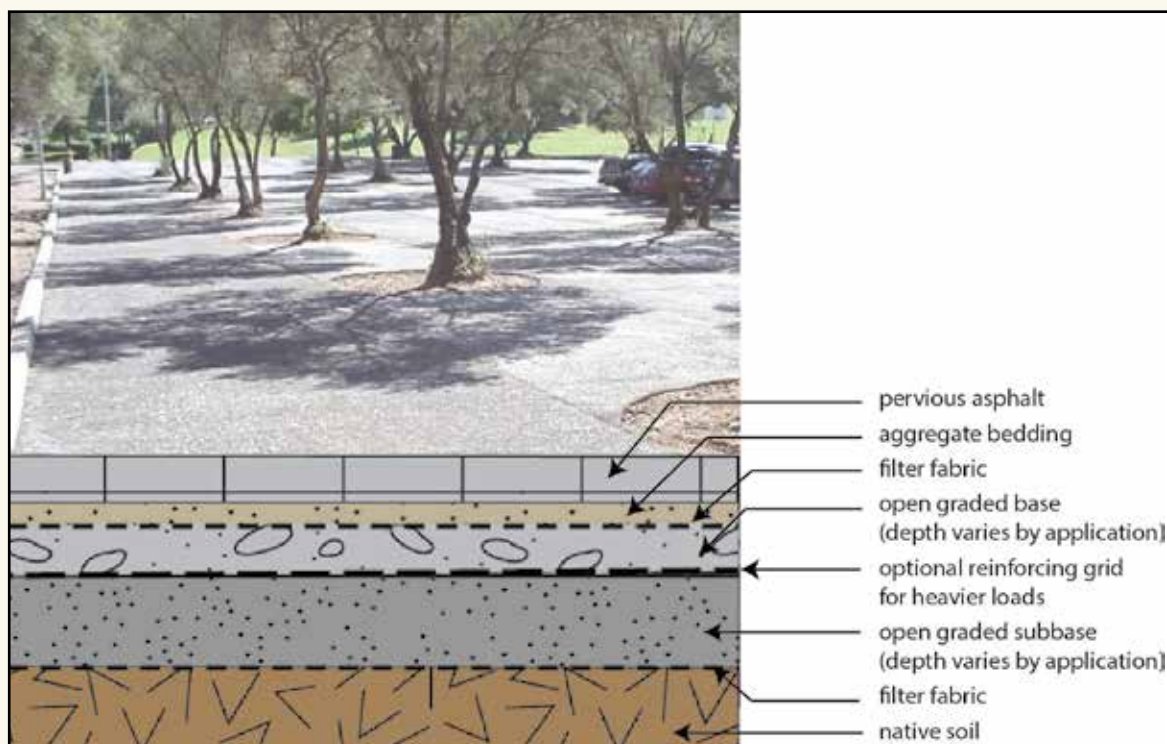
Typical section of pervious pavement. (Diagram adapted from Huber, 2011).
